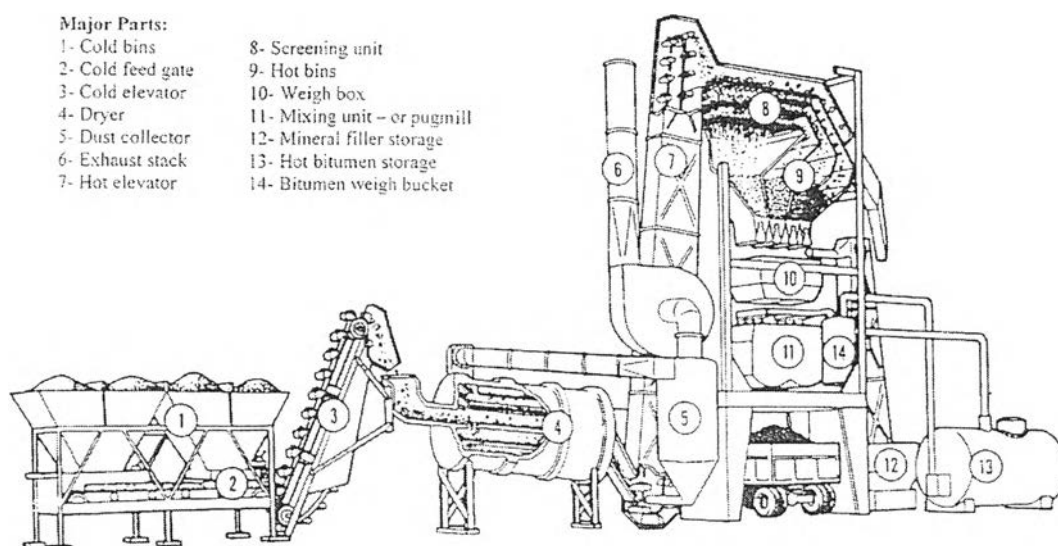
Details hot-mixed asphalt plant (Aditya, 2011).
